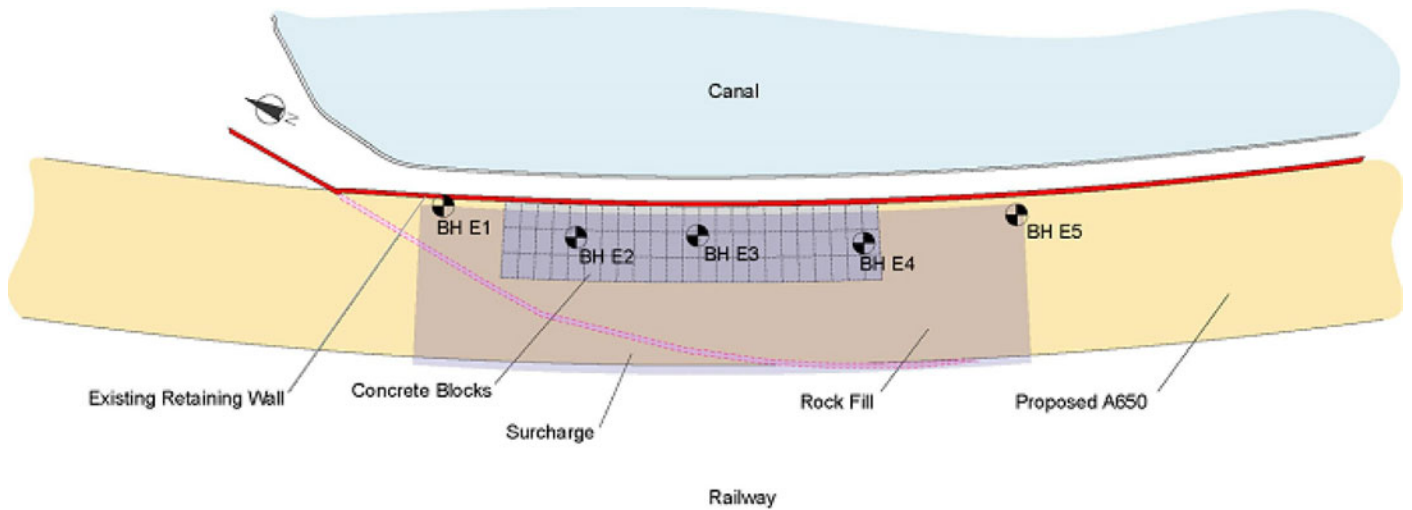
Schematic plan of special earthworks, borehole location, canal wall and canal
